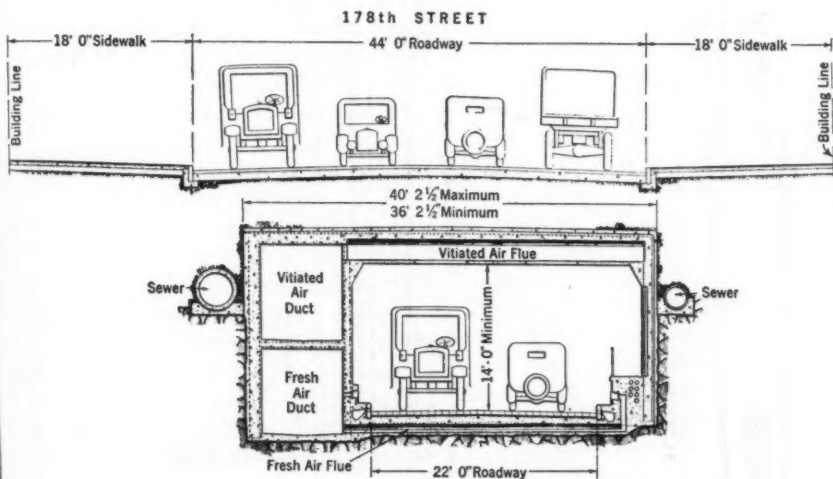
CROSS-SECTION OF TUNNEL IN WEST 178TH STREET, NEW YORK, N. Y.
